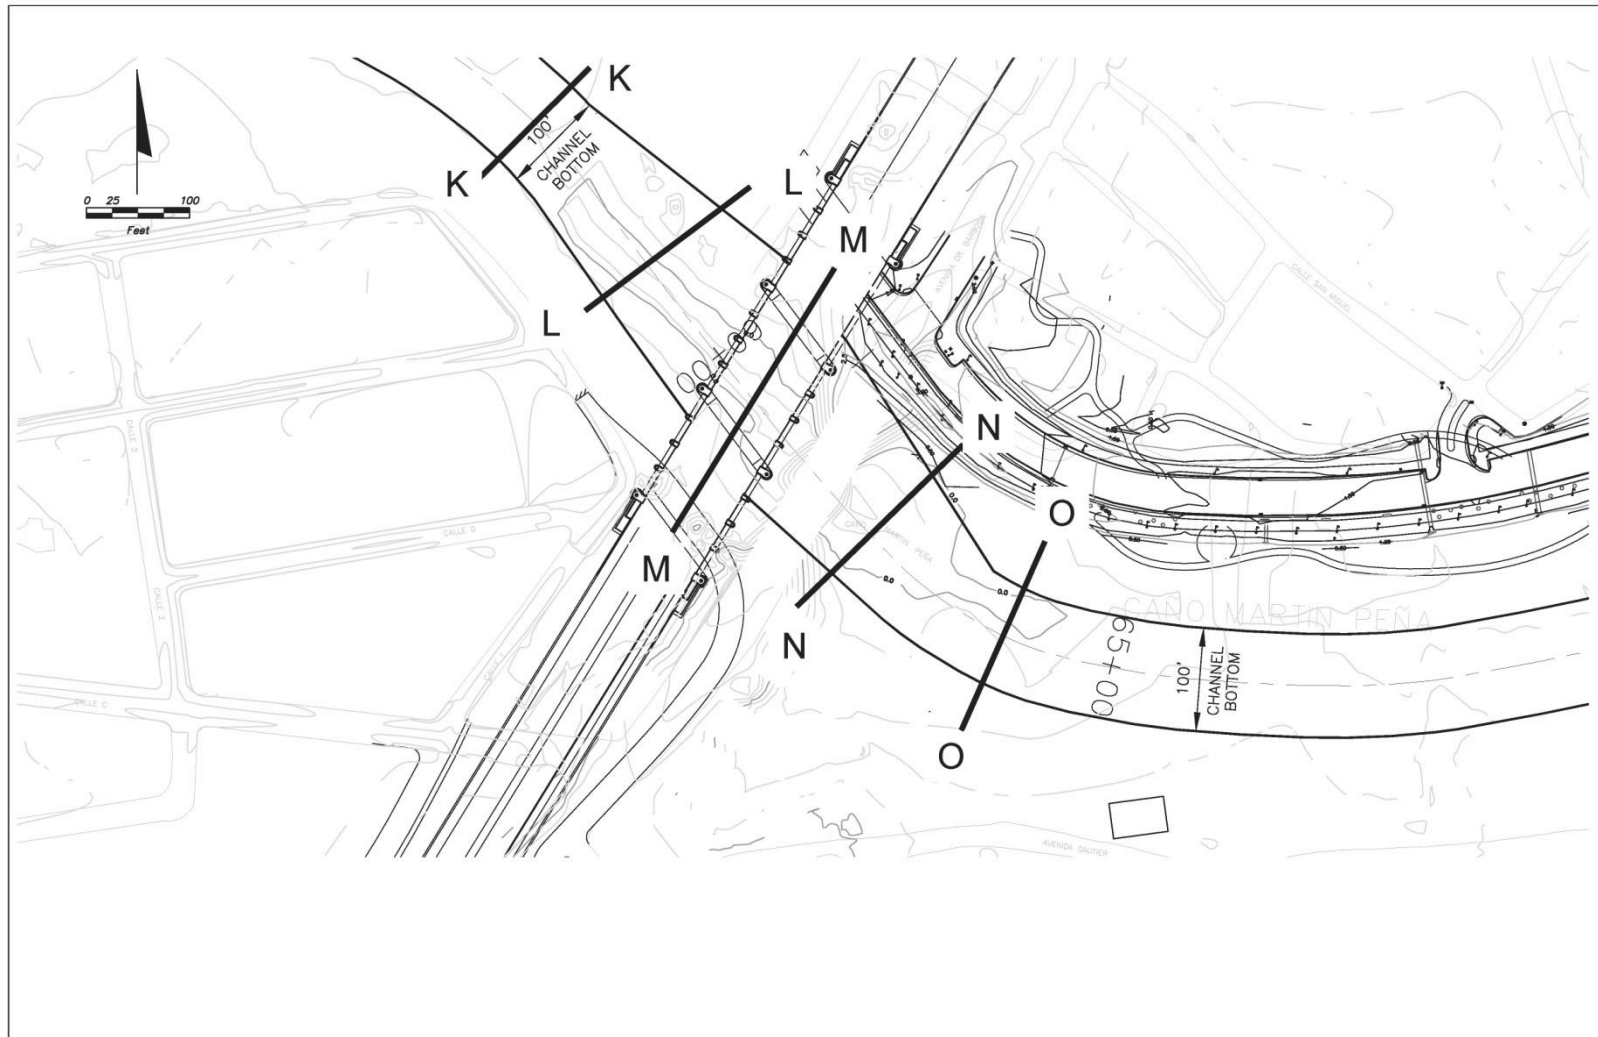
Cross Section Plan Locations, Dr. Barbosa Avenue Bridge
